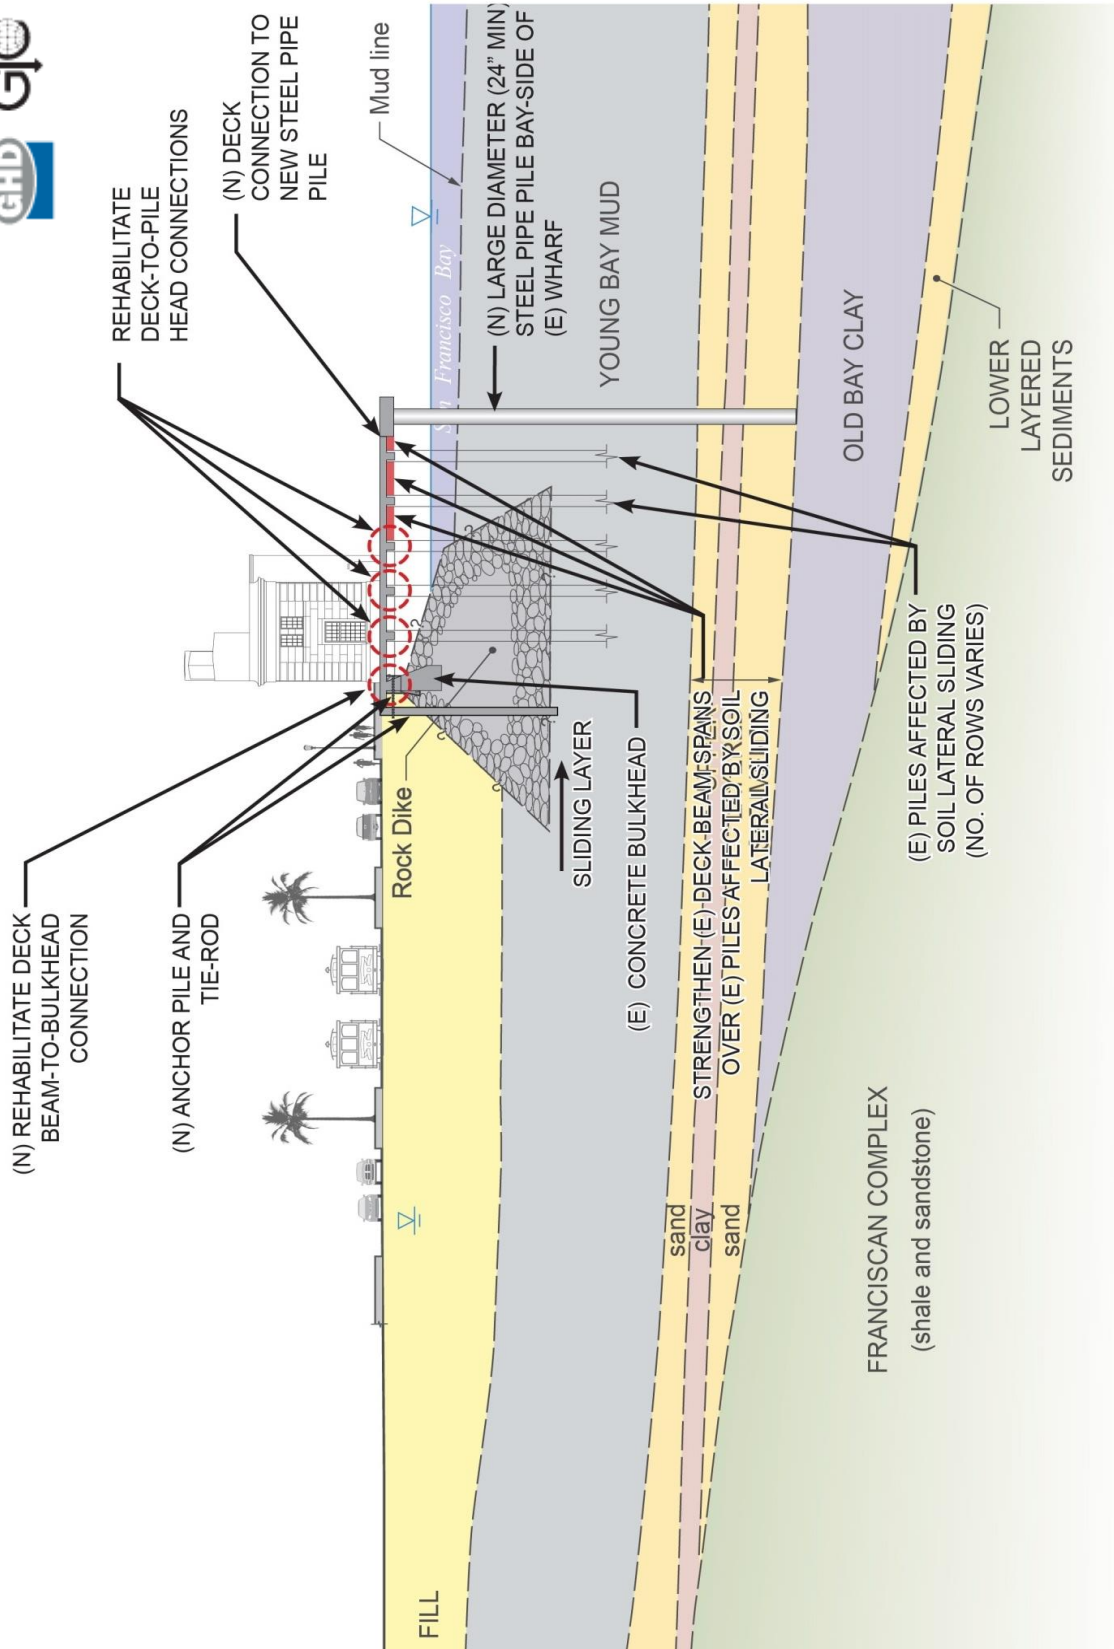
Typical Section Bulkhead Wall and Wharf Retrofit (S-11) Summary of Retrofits
